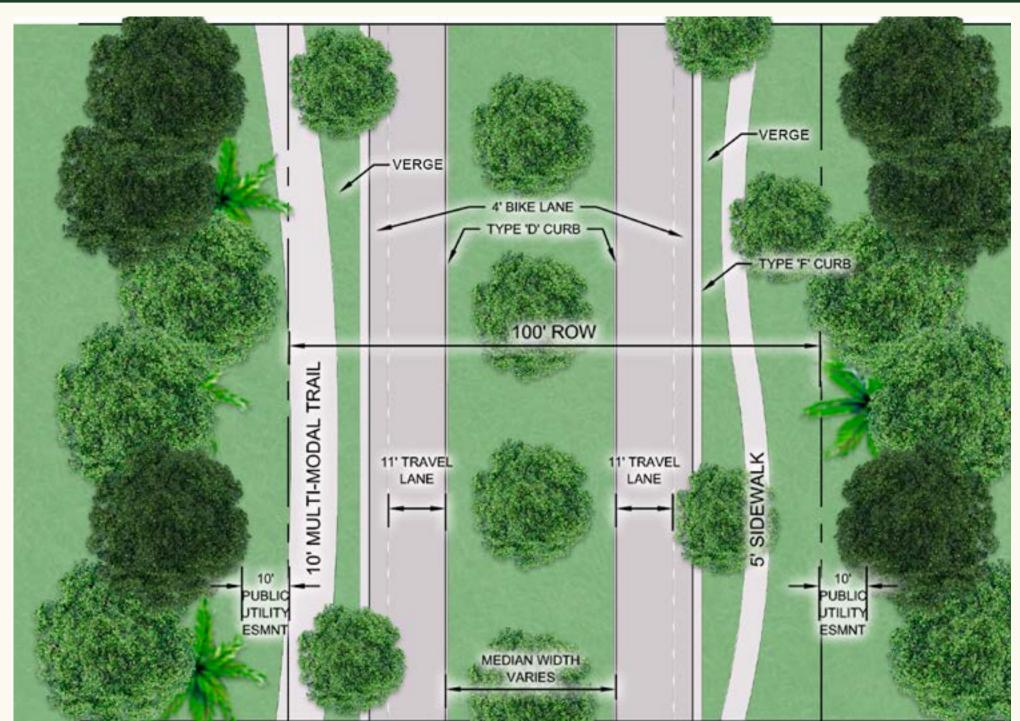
B1 (not to scale) Typical 100' ROW Collector Road Plan Street Tree - In median and open space
